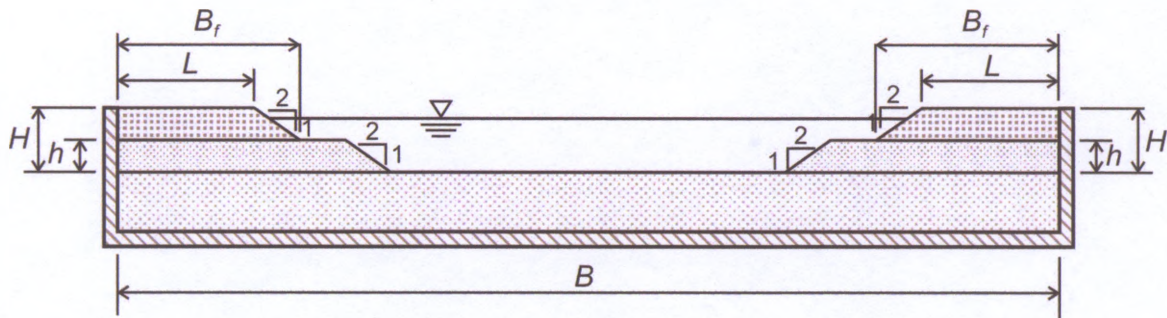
Cross section of equivalent main channel, floodplains, and embankment layout
